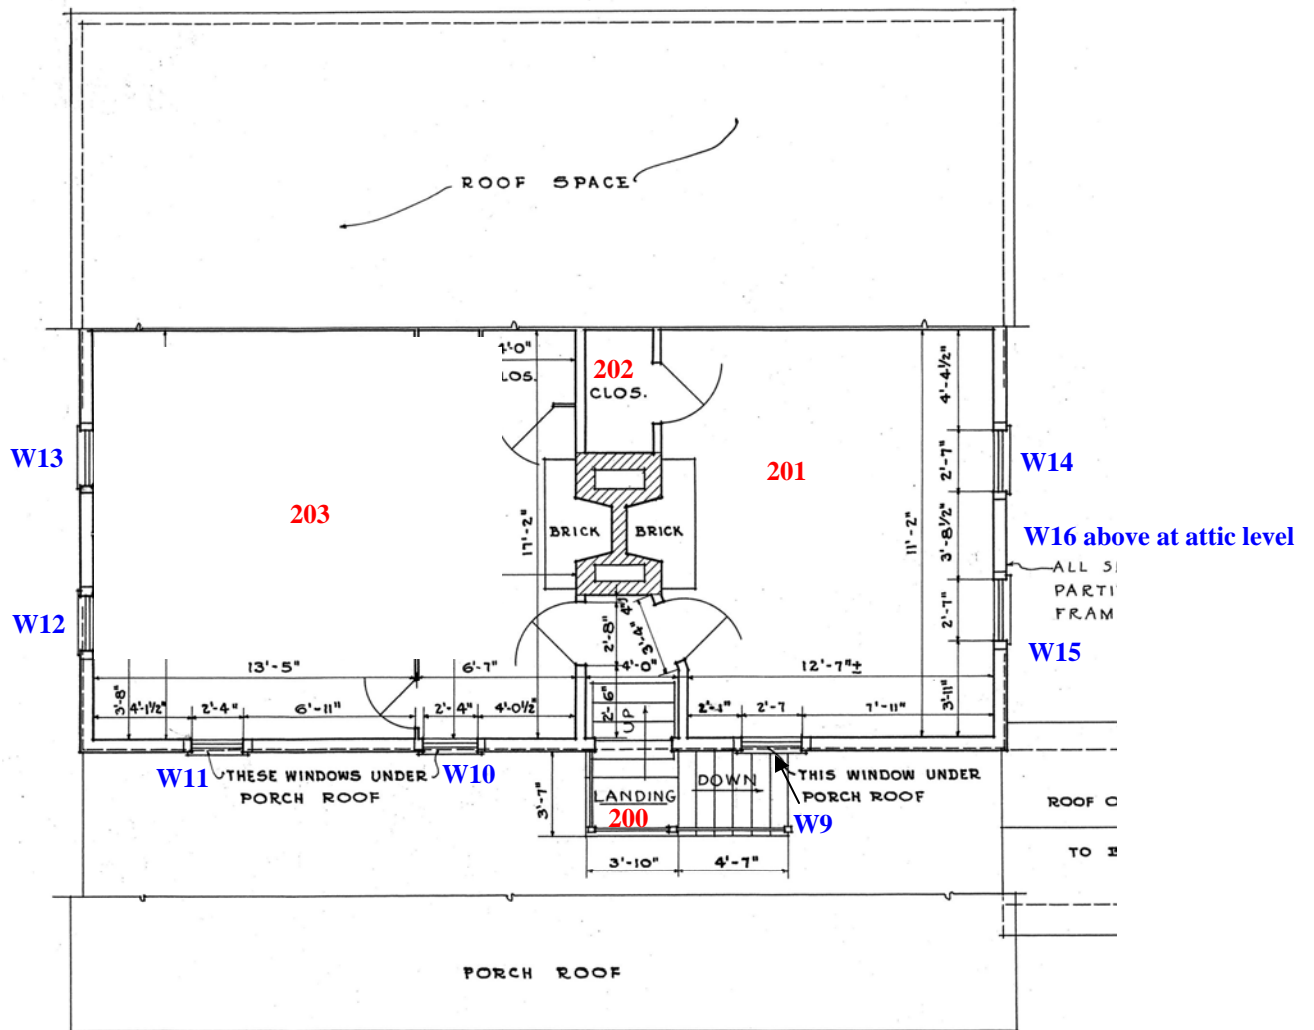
Location of windows on second floor (modified 1934 HABS drawing)
